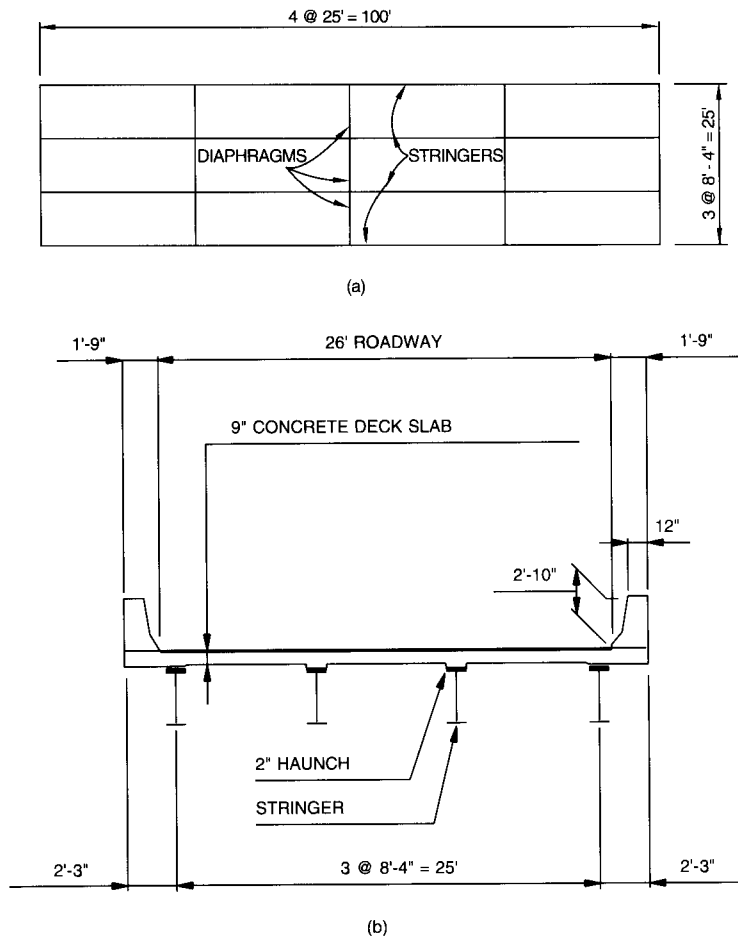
Two-lane highway bridge with plate-girder stringers. (a) Framing plan. (b) Typical cross section.
